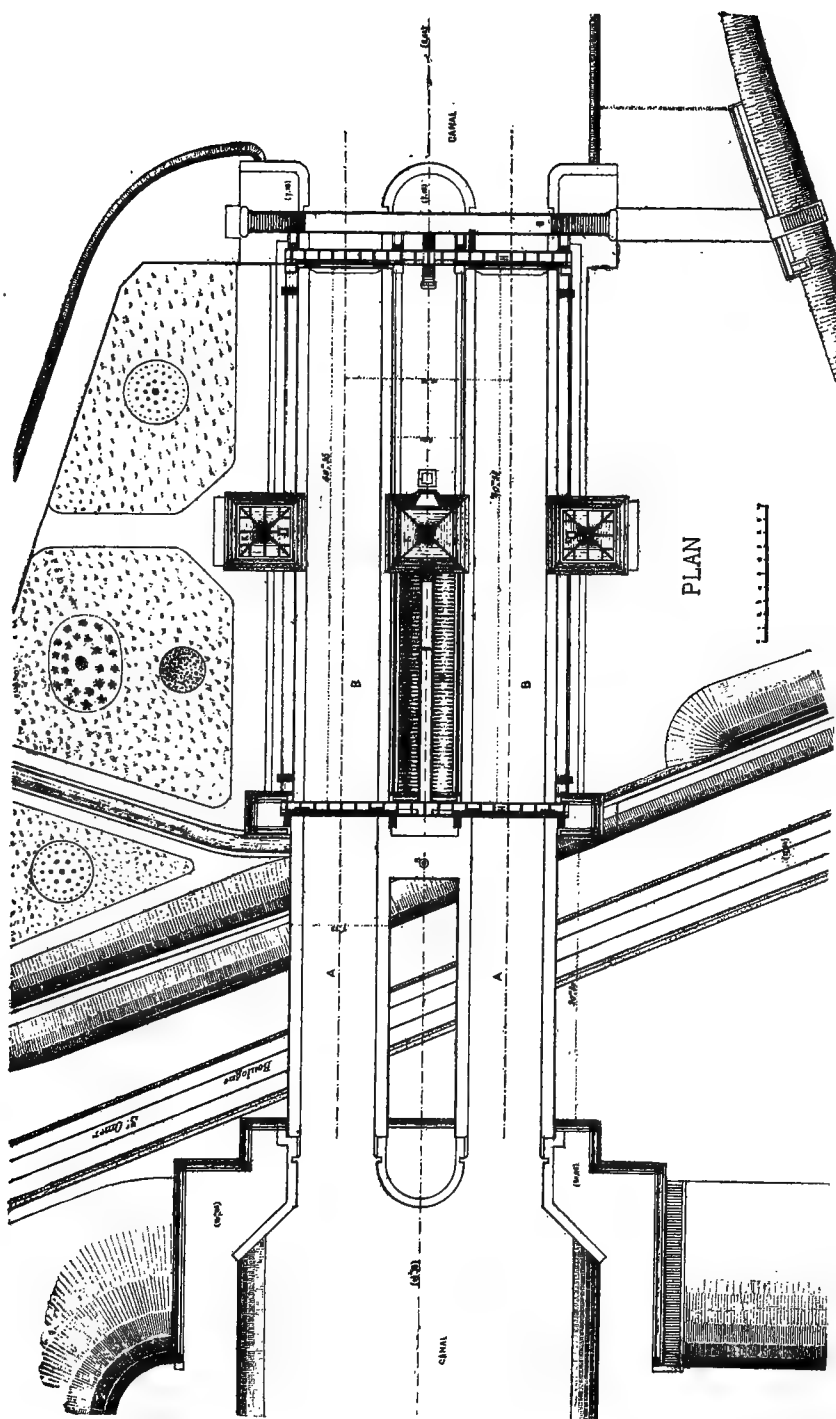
Plan of the hydraulic lift at Les Fontinettes. A A, canal bridge with two separate lines or branches crossing the railroad from Boulogne to St. Omer; B B, movable troughs; H H, frames supporting the gates; K K, towers; L, lookout cabin; M, machine house; Q, service bridge; S, capstan.
